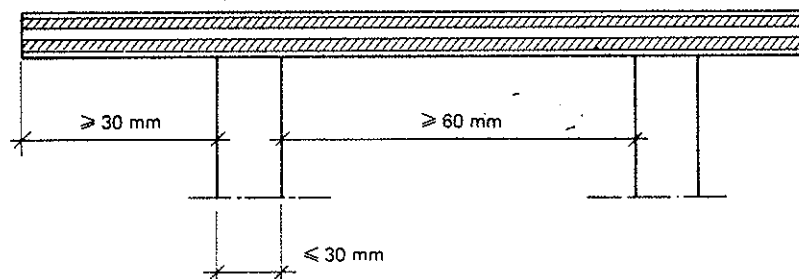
213b: Continuous glued joint between sheet material deck and ribs not less than 30 mm wide.
